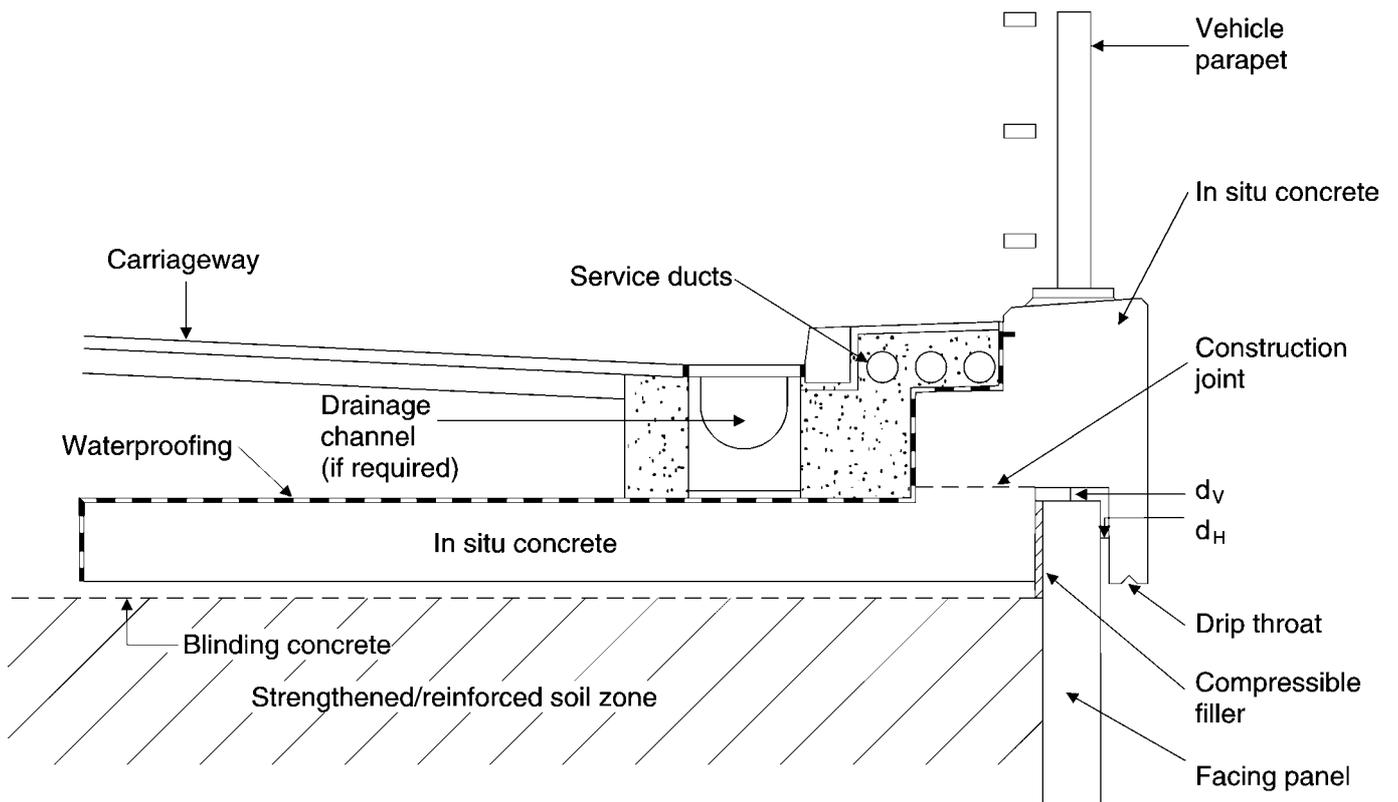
Typical detail of a parapet-supporting base slab at the top of a strengthened/reinforced soil wall with in situ concrete coping
